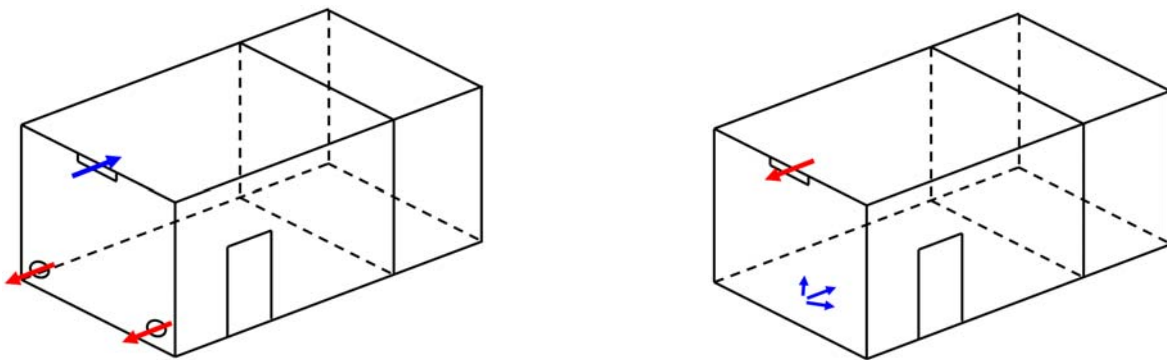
Configurations of the air in- and outlet openings of the test room for mixing (left) and displacement ventilation (right).
